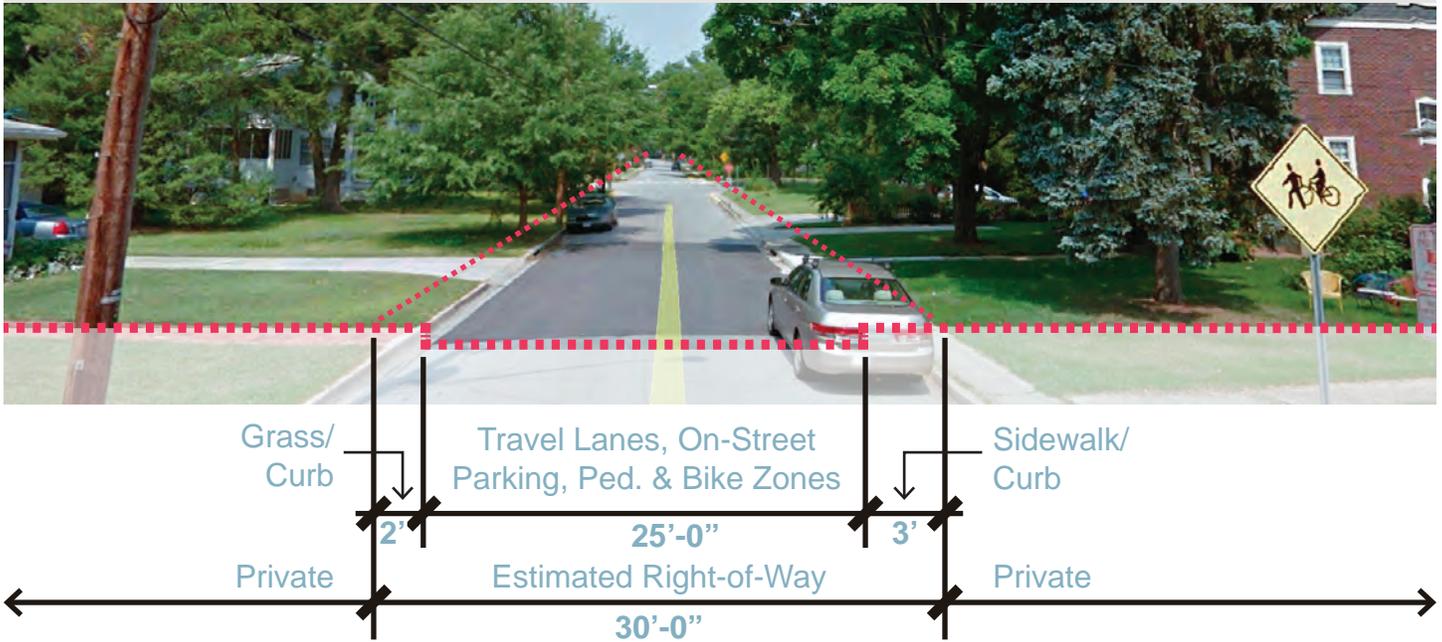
| GUILFORD ROAD (STREET VIEW AND SECTION)
